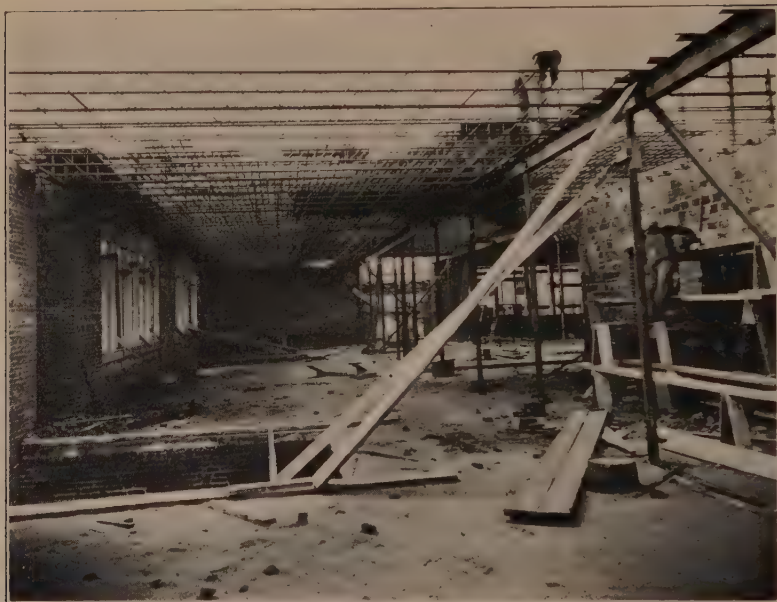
STEEL JOISTS IN SCHOOL BUILDING
